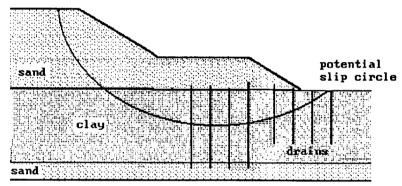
Application of drains to prevent failure during construction of embankment.
